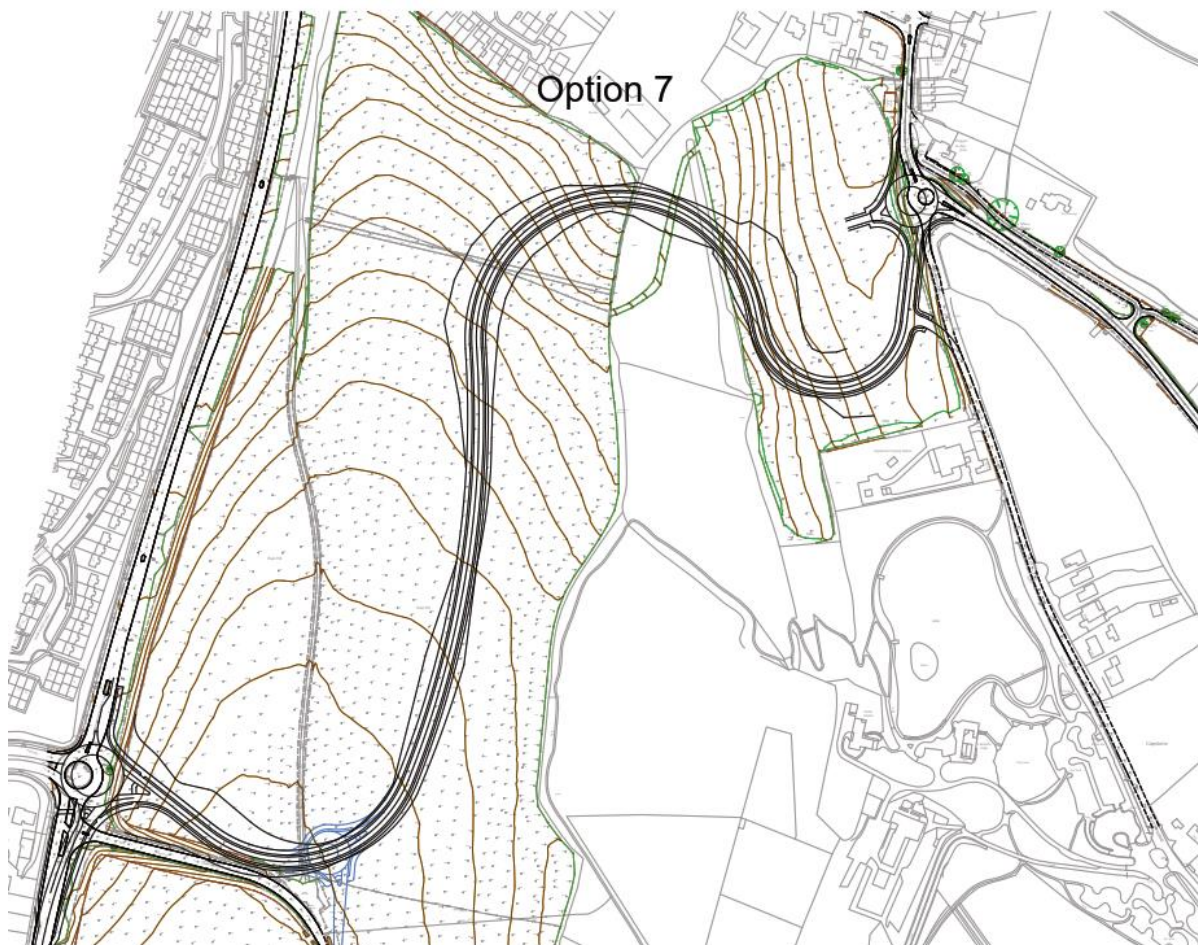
Development and New Link between Capstone Road and North Dane Way
